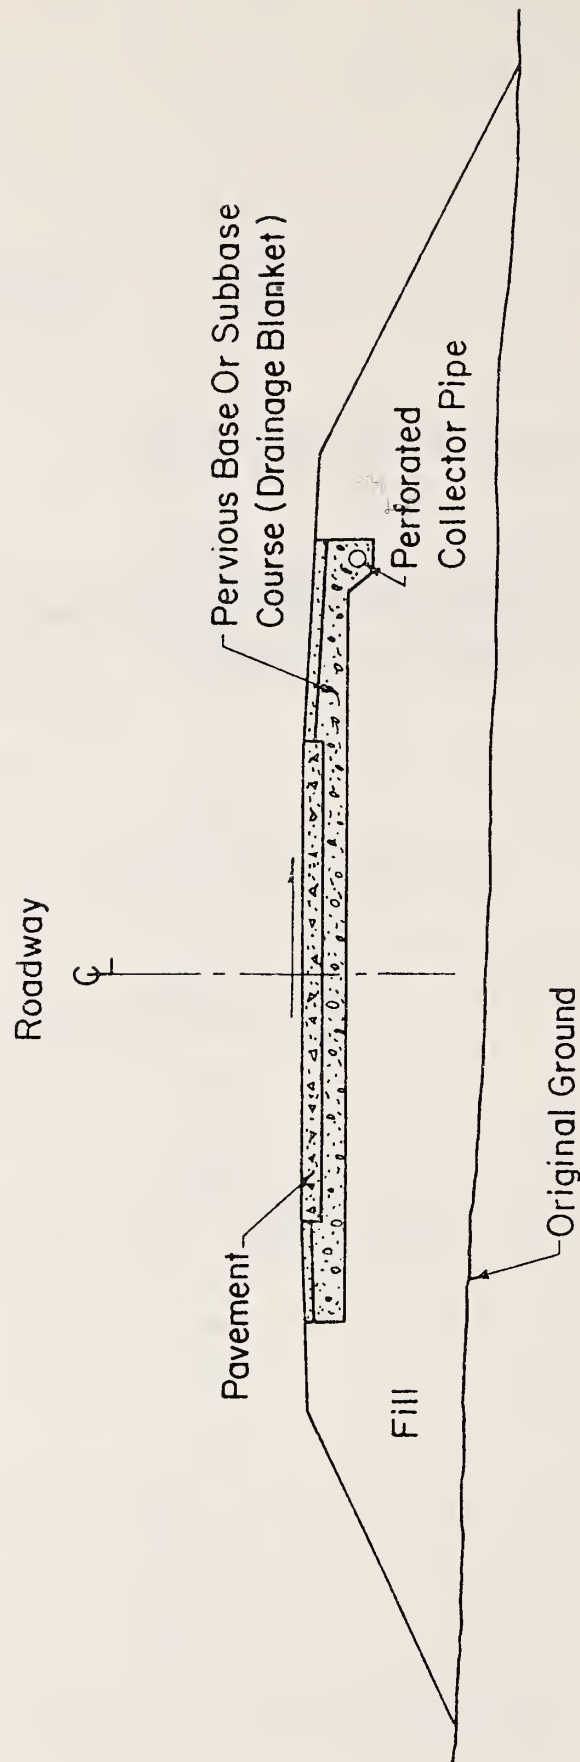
Longitudinal Collector Drain Used to Remove Water Seeping Into Pavement Structural Section (14).
